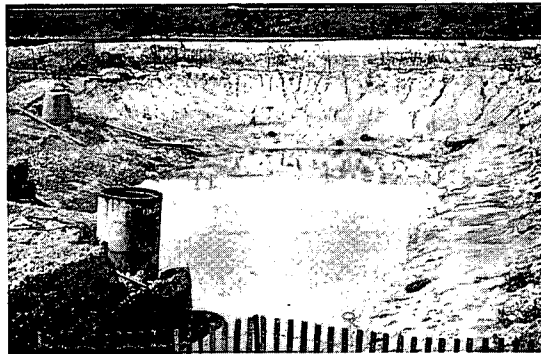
This photo shows a leachate collection pond with no on-site treatment.
